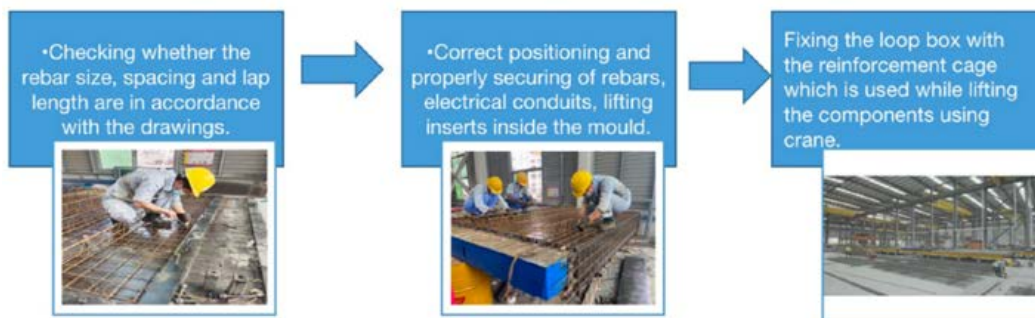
Fixing of rebars of a prefabricated RC slab.
